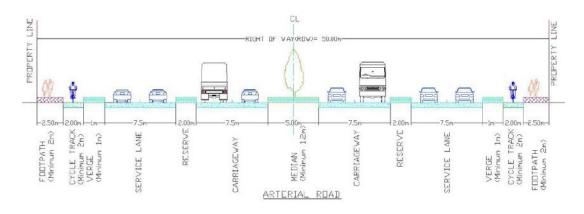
12 Typical section of arterial roads (Nepal Urban Road Standard, 2076)
